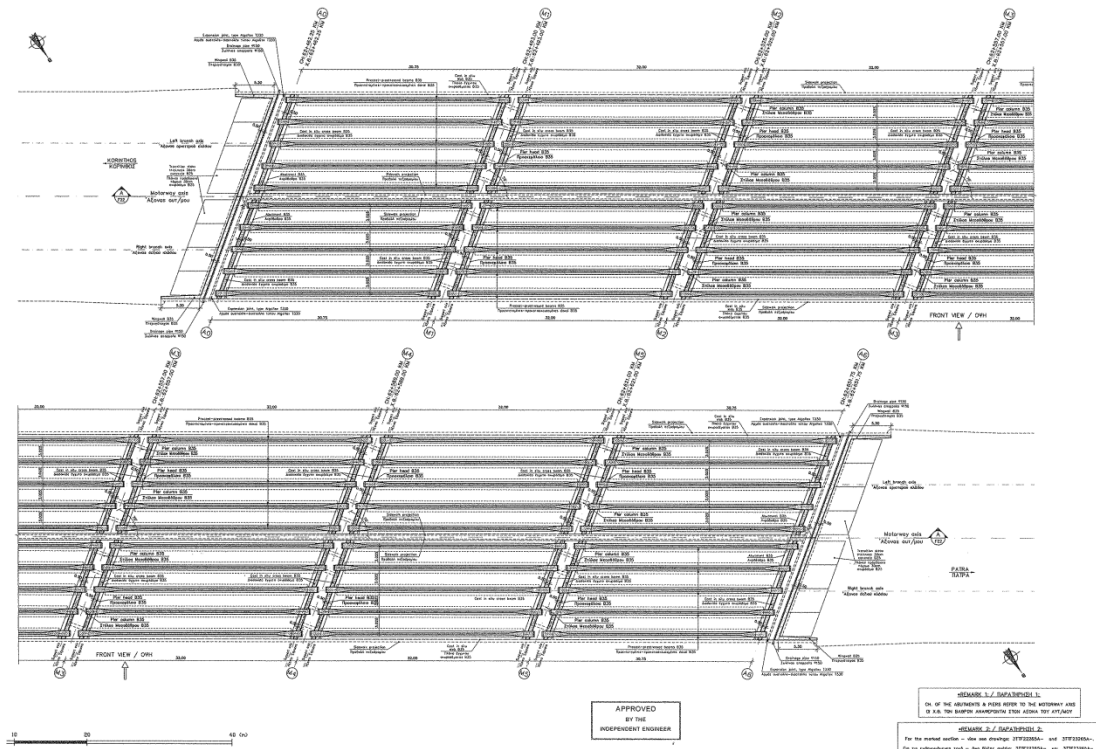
RIVER BRIDGE DECK SLAB BEAMS (Source: Author’s proposal)
